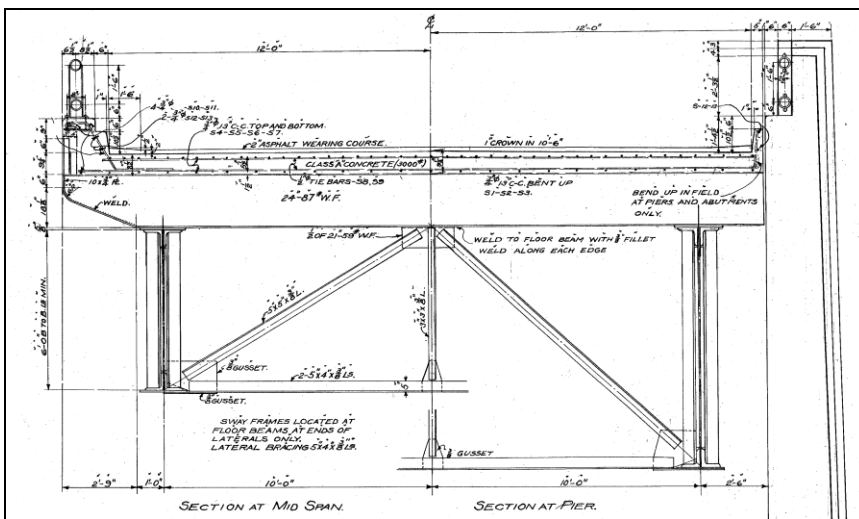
Section drawing from plans, Sheet 21 of 30, May 1934 (NHDOT 1934).
